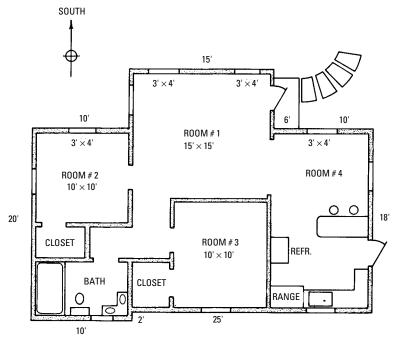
Floor plan of a one-story residence constructed on concrete slab.
